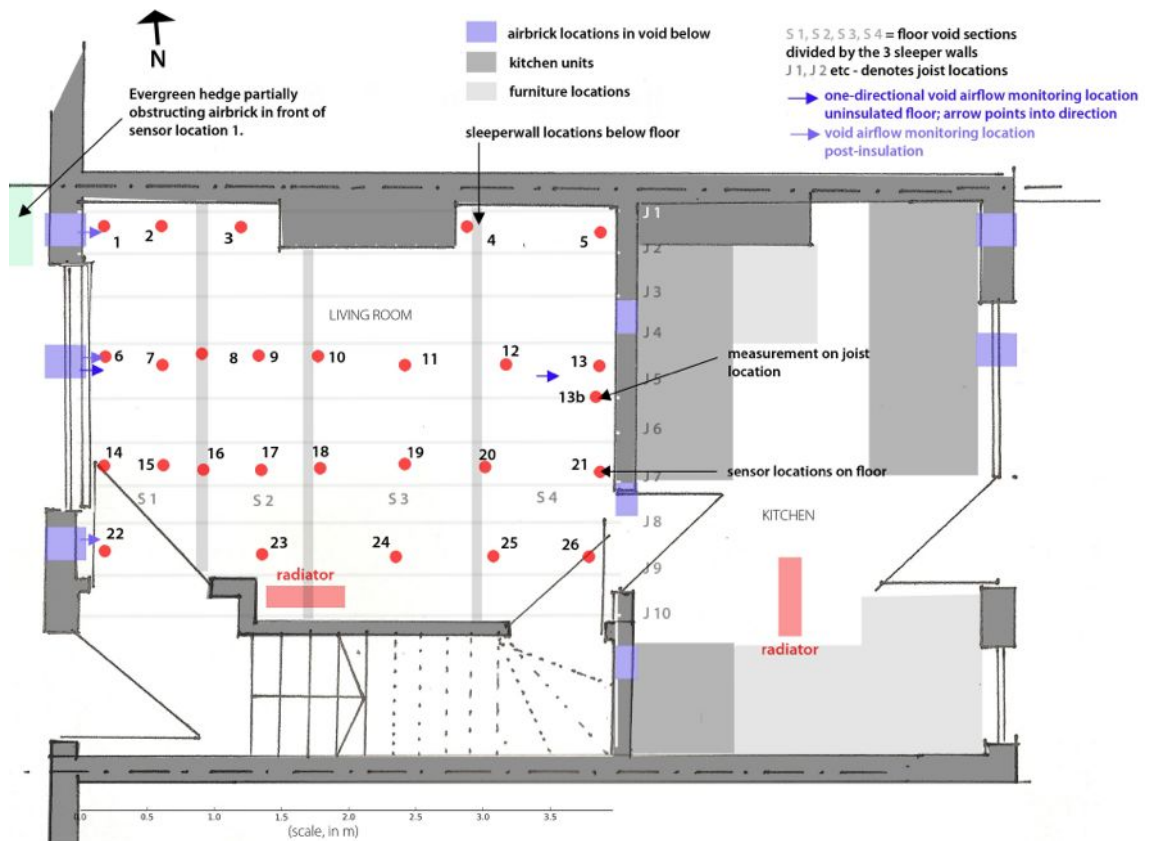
Case study floor plan with heat-flux sensor locations (marked in red); airbrick locations (blue); and sleeper walls (grey). Approximate joist locations are marked with a faint grey line and annotated with J1, J2 etc. Locations 1 to 5 are in line with the partially sheltered airbrick though locations 4 and 5 are located further away, behind the chimney. Locations 6 to 13 are located in line with the central airbrick, representing one of two higher resolution monitoring grids; the second higher-resolution grid includes sensors in locations 14 to 21, which are not located in line with an airbrick. Locations 22 to 26 are located in line with another exposed airbrick, while location 13b is the only location measured on a joist. Portable electrical radiators are marked in red. Figure 45.a. and b. illustrate sensors in-situ.
